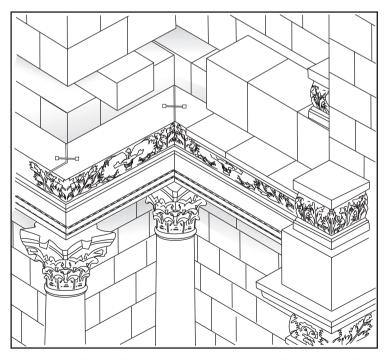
Severan Theater: isometric reconstruction of connections of inner and outer corners of architrave-frieze elements.
